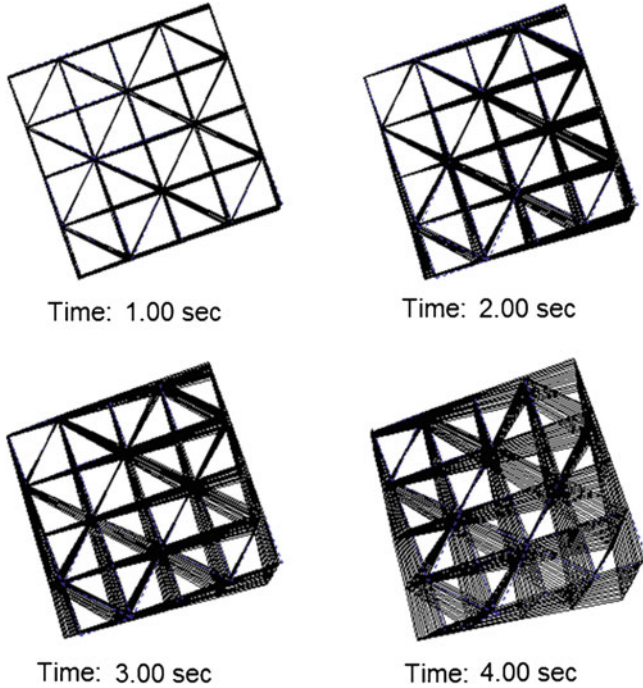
Deformed shape of the building as collapse progresses in plan view
